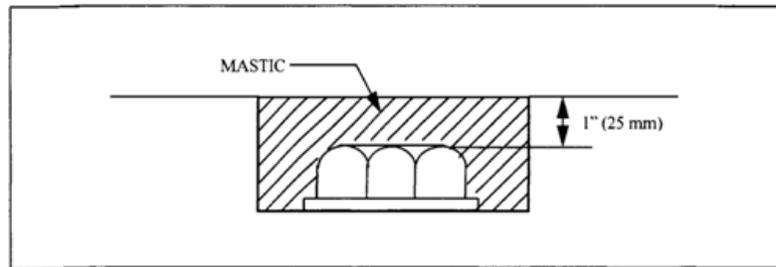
Countersink depth for bolts in timber fendering
